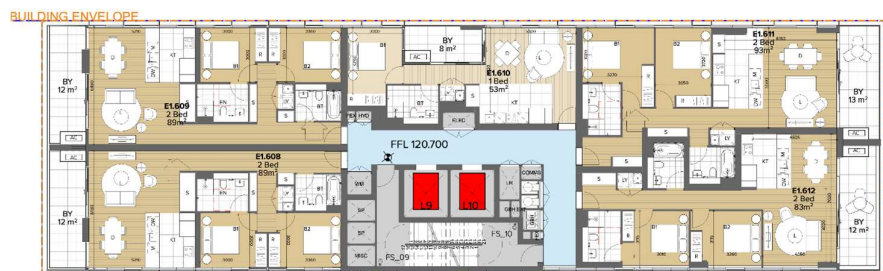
Amended SSDA scheme showing revised typical layout of Building E1 upper level (Source: Turner Studio)
